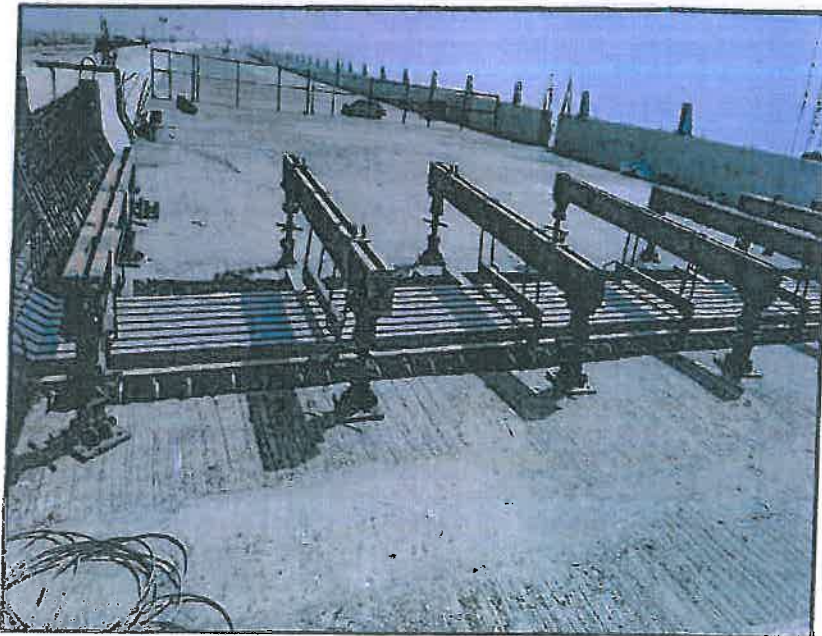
Intertidal Section- EJ Fixing Trail Work At MP-20
